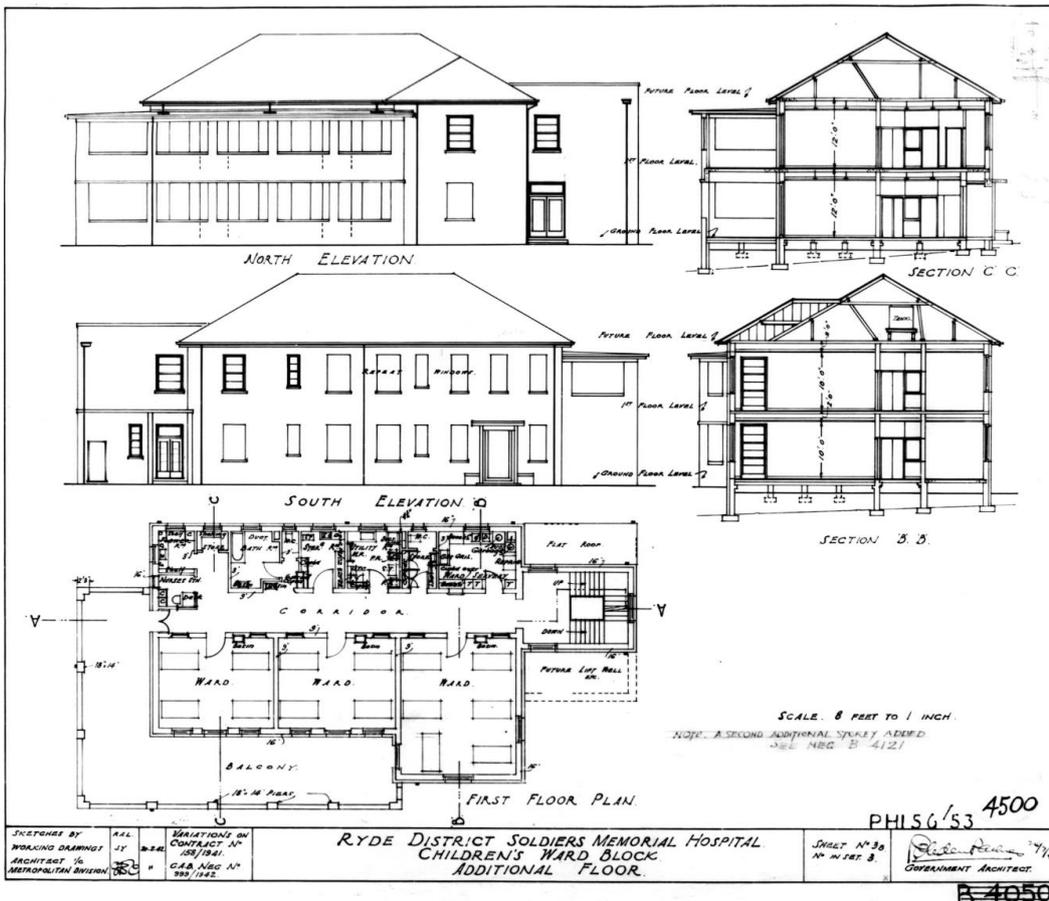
Sections, plan and elevations of Trigg House (two storeys) (1942)
